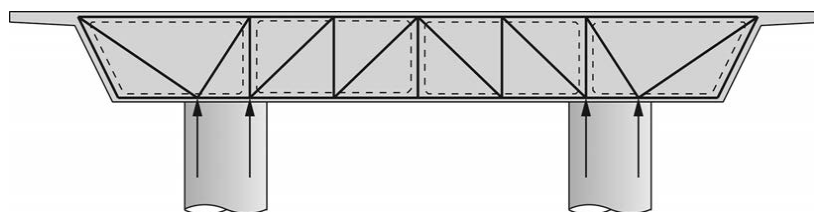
Potential Strut-and-Tie Layout for Diaphragms Considering Monolithic Column Connection (Taken from FHWA, *Post-Tensioned Box Girder Design Manual*, 2016)
